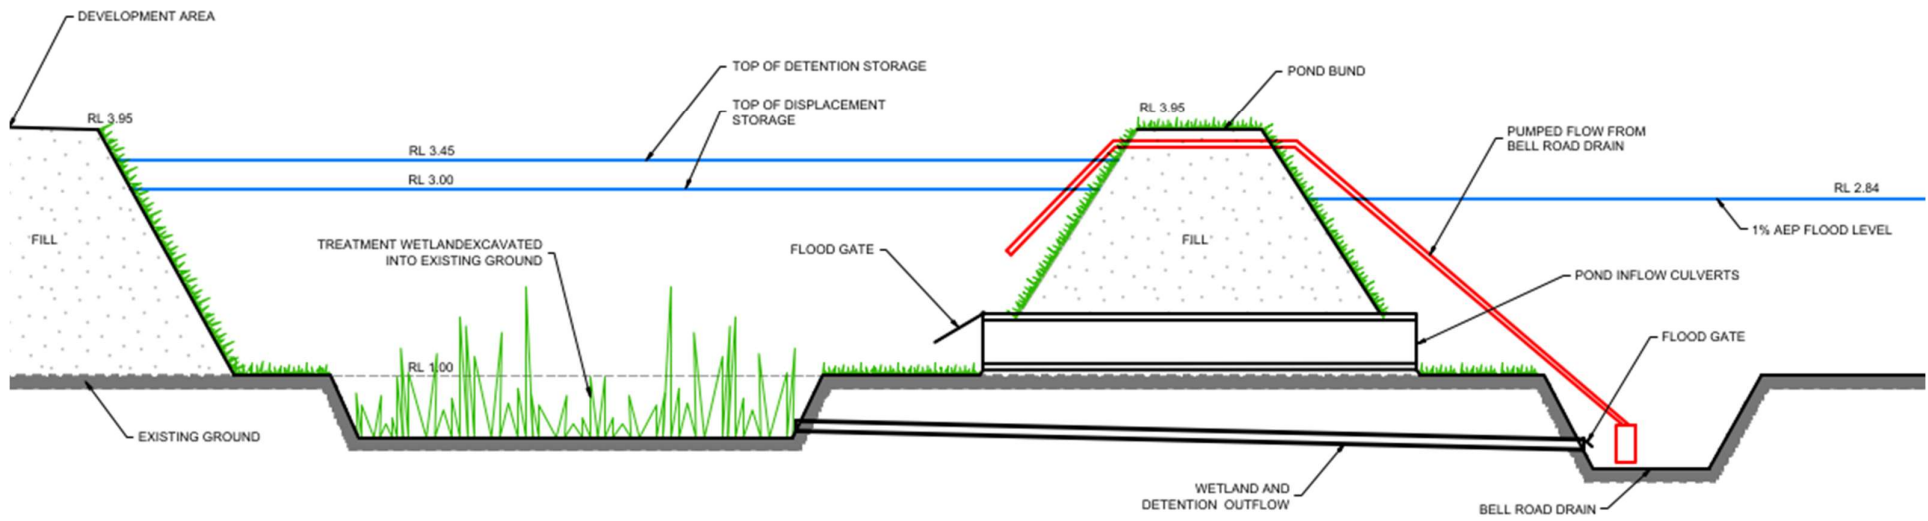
Typical Stormwater Management Area (SMA) Cross Section
